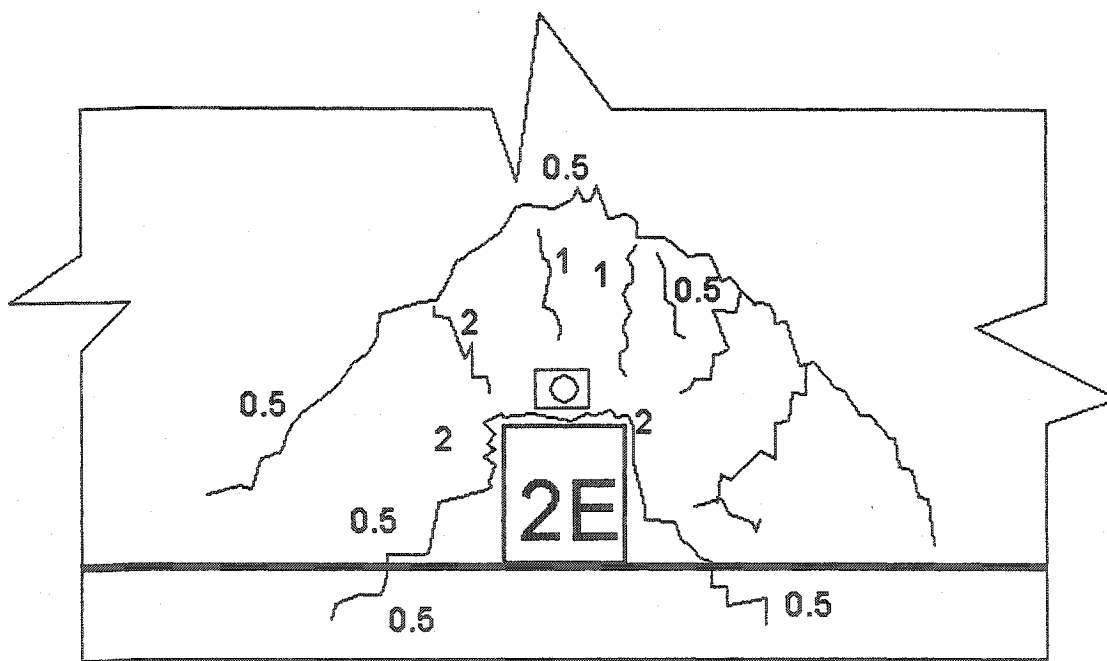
crack pattern of connection 2E. (the size of cracks are in mm)
